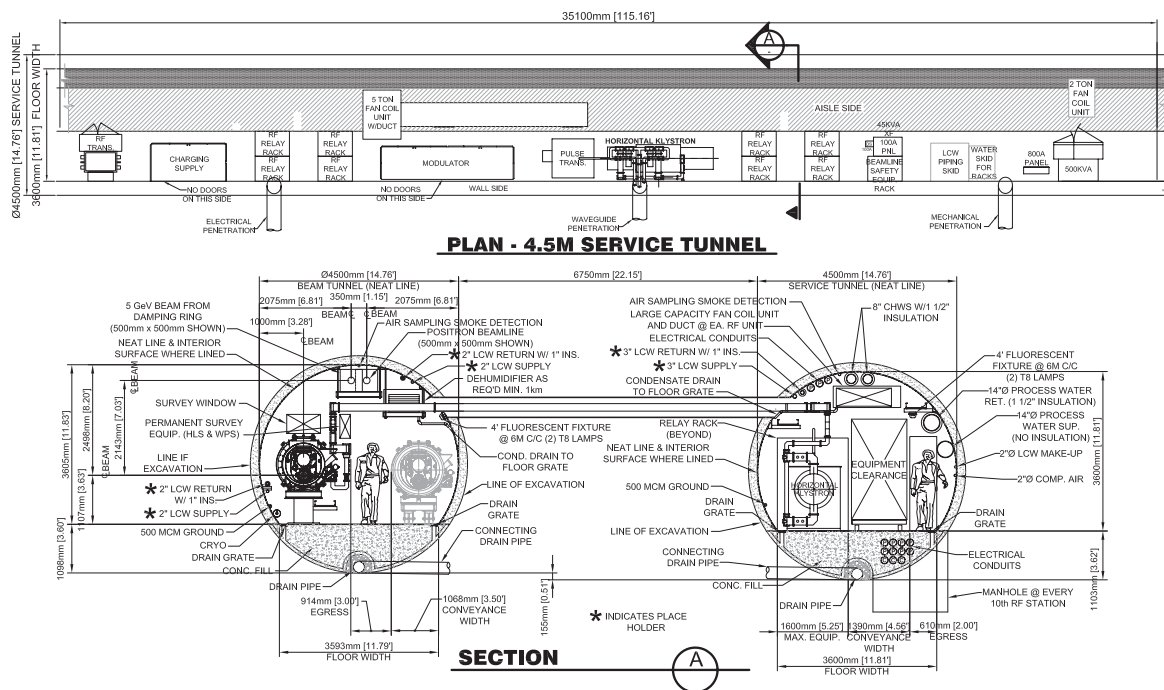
Plan view of service tunnel components in Main Linac (upper). Cross section of two Main Linac tunnels (lower).
